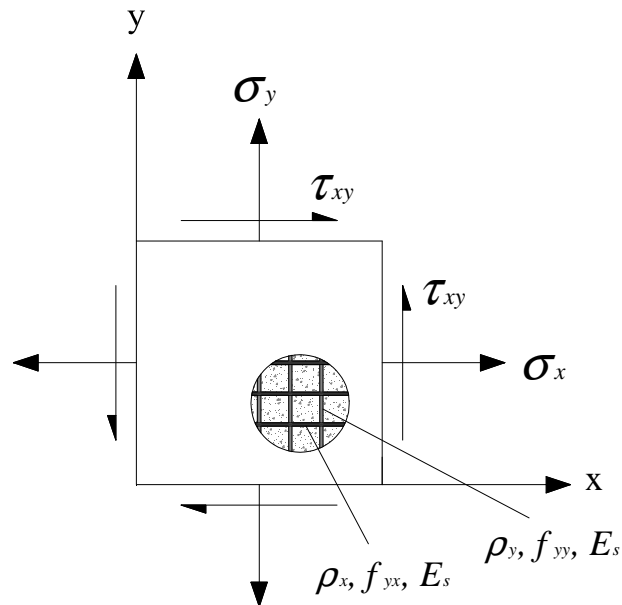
Reinforced concrete membrane element subject to in-plane stresses
